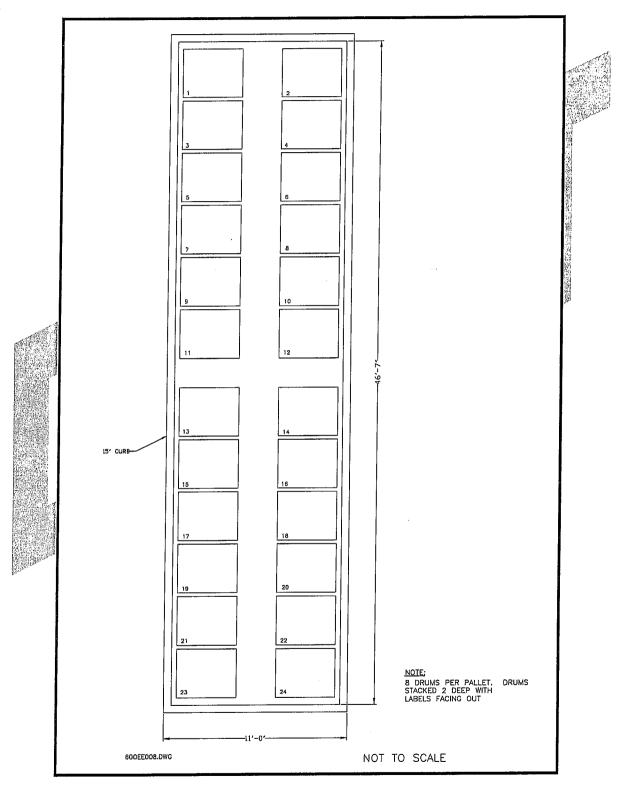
Containment Area in Building S22895 at the Hazardous Waste Storage Facility
